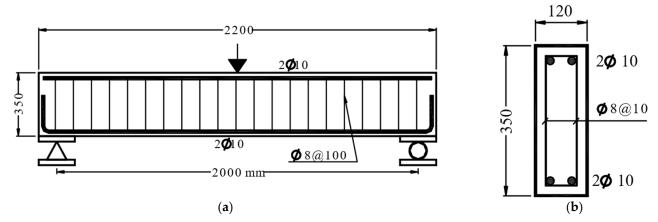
(a) Beam elevation; (b) Beam cross-section.
